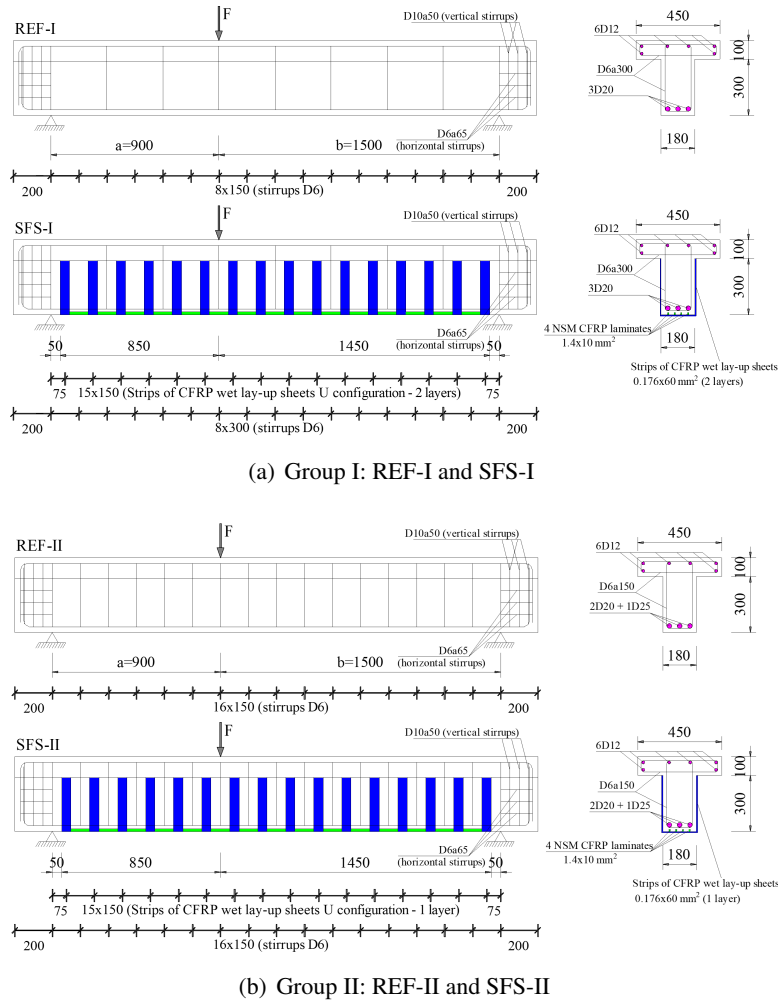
Layout of tested T-beams (dimensions in mm) [16]
